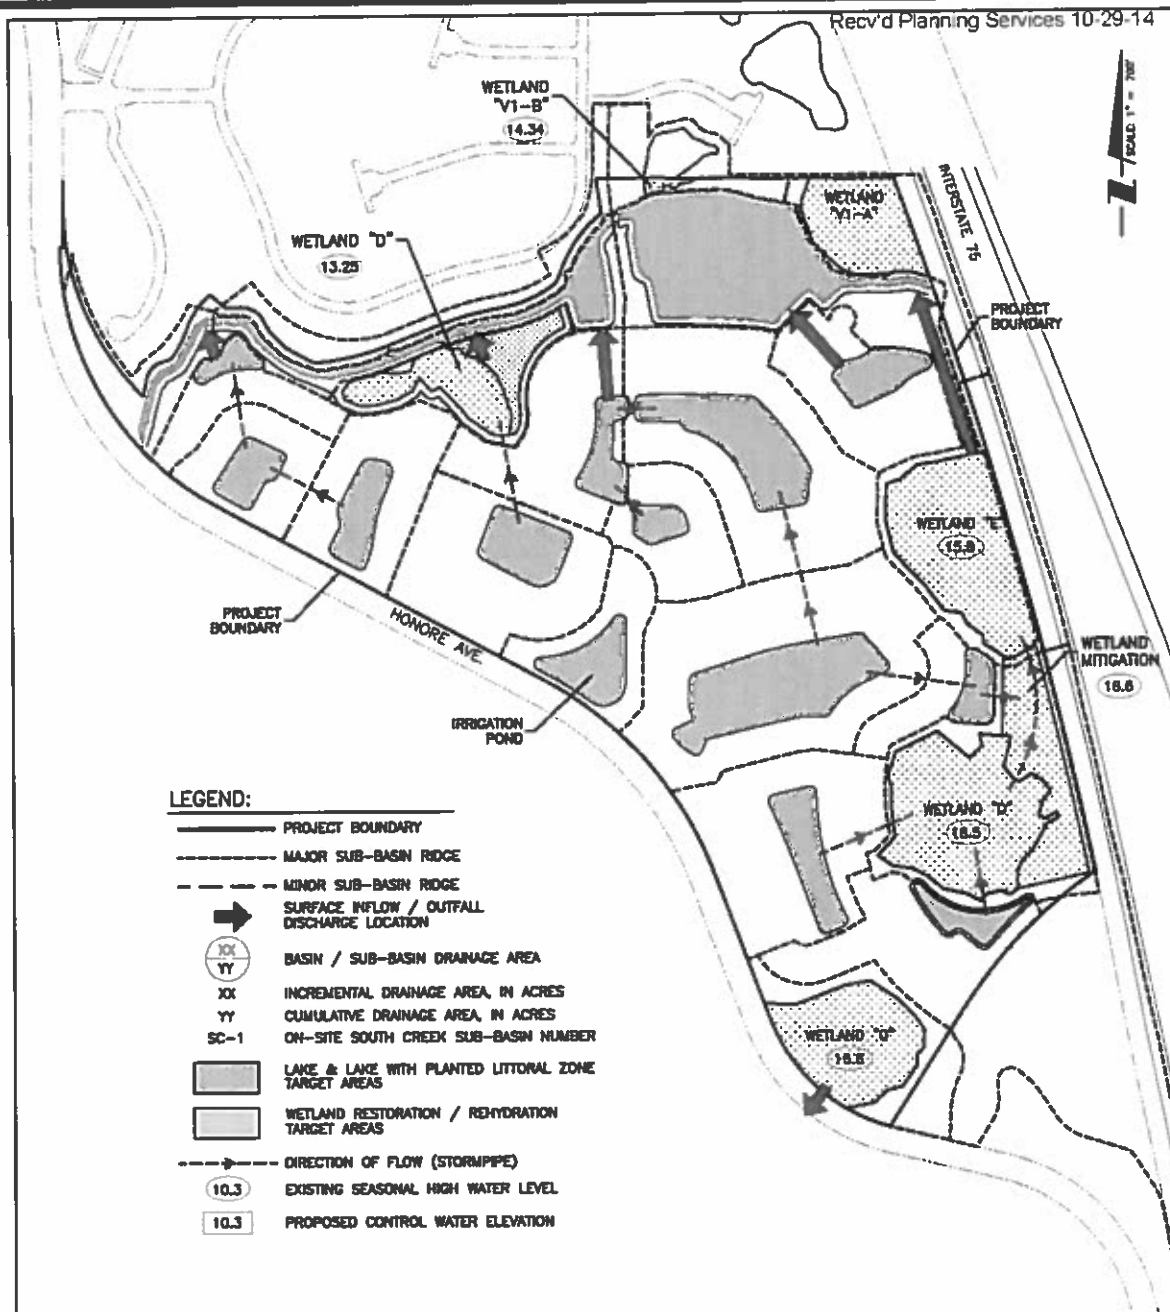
EXHIBIT F – CONCEPTUAL ON-SITE SURFACE WATER MANAGEMENT PLAN
